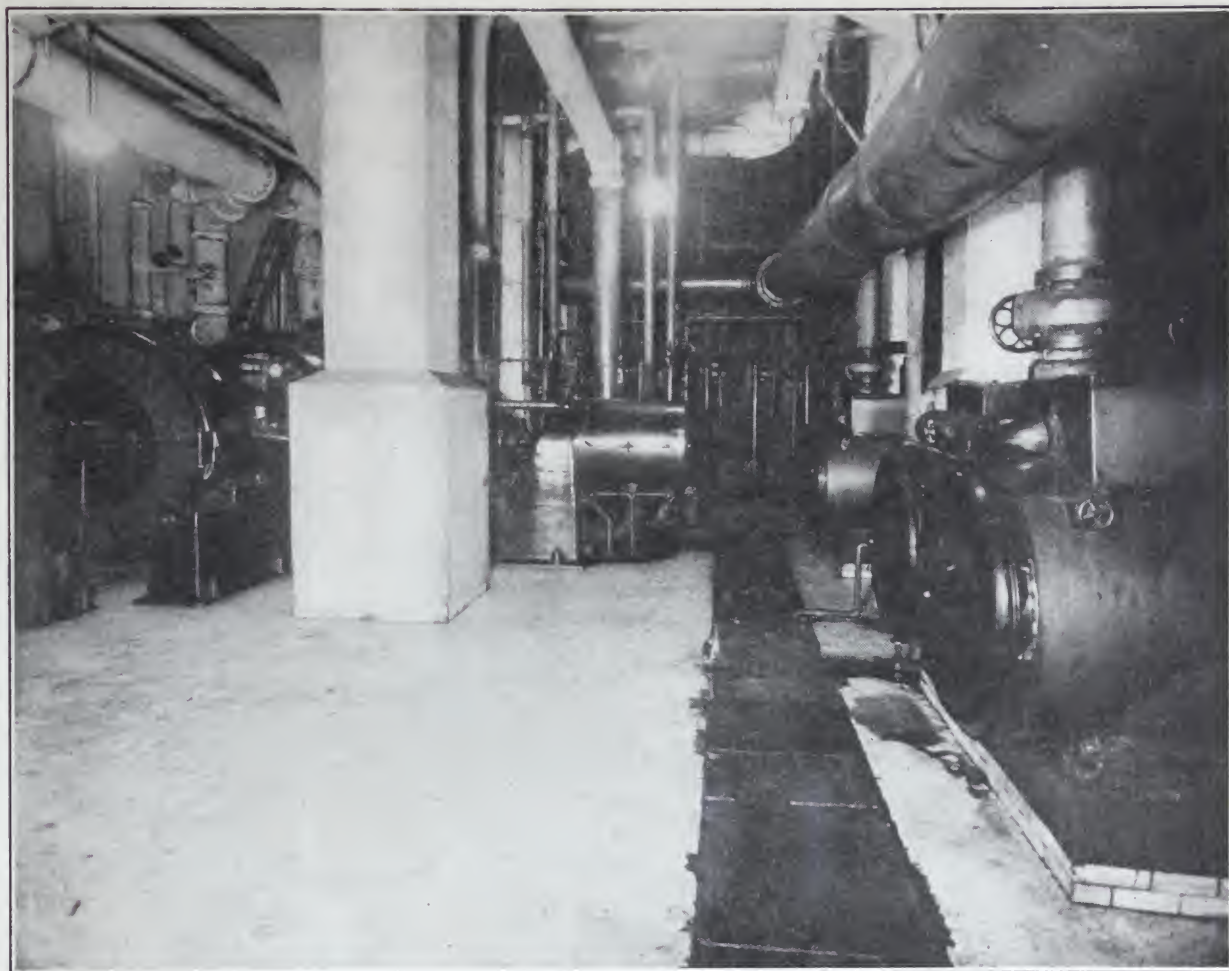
Switch Board Equipment of Former Power Plant in 24-Story Bank and Office Building
